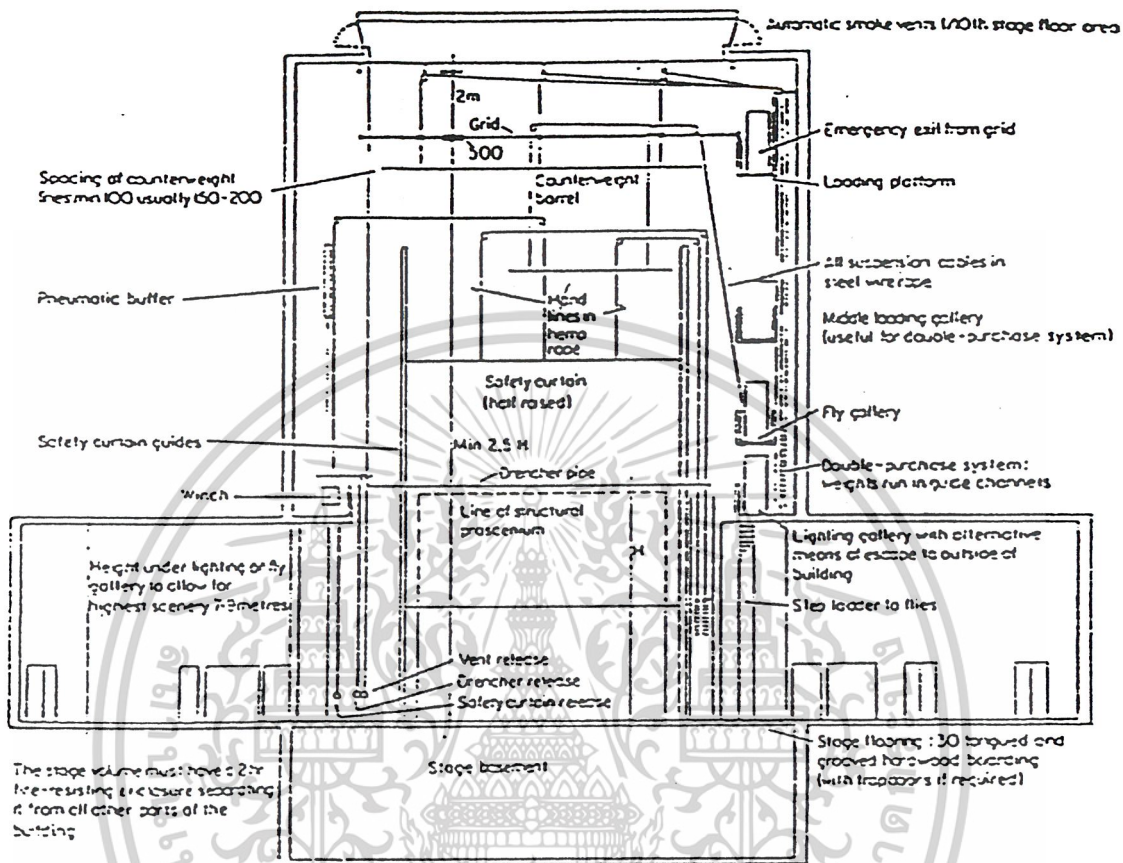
Typical section through stage and fly tower looking towards auditorium
